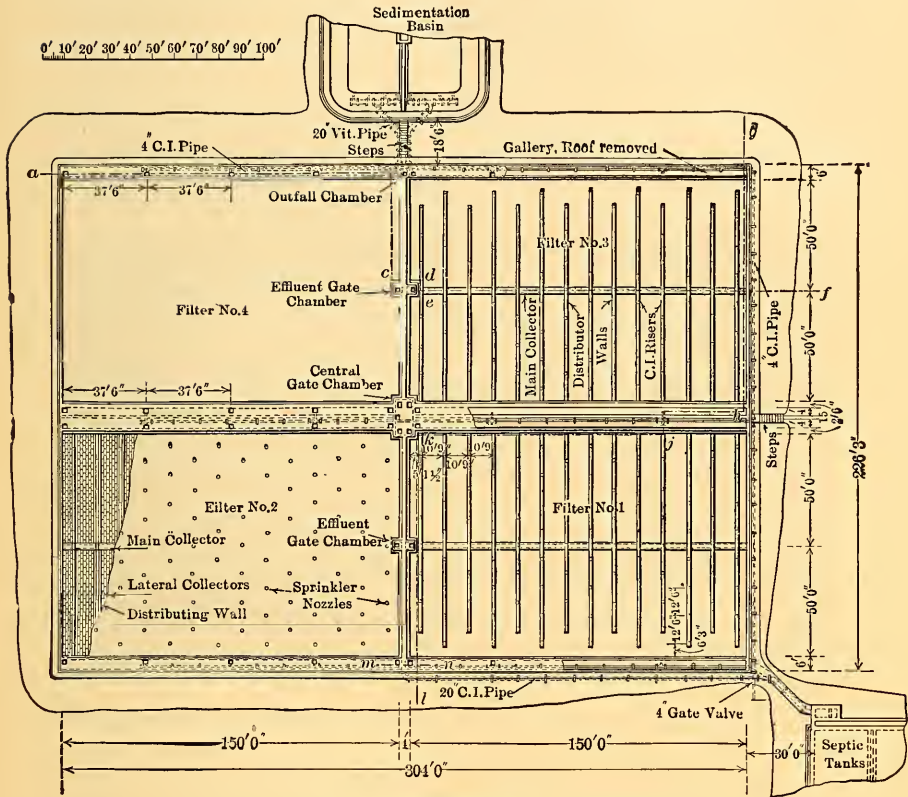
Plan of Tricking Beds at Washington, Pa.
